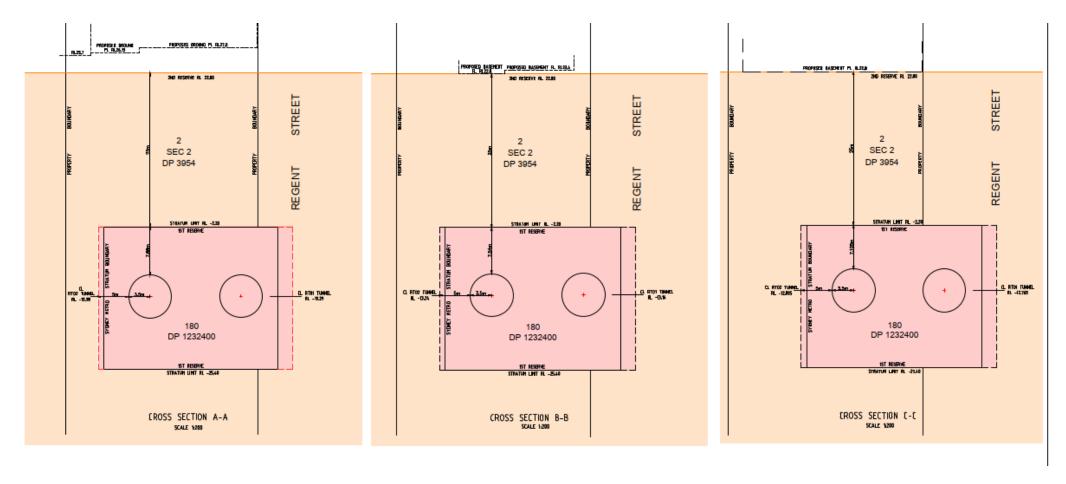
Sydney Metro Tunnel Sections, Including Proposed Basement Level
